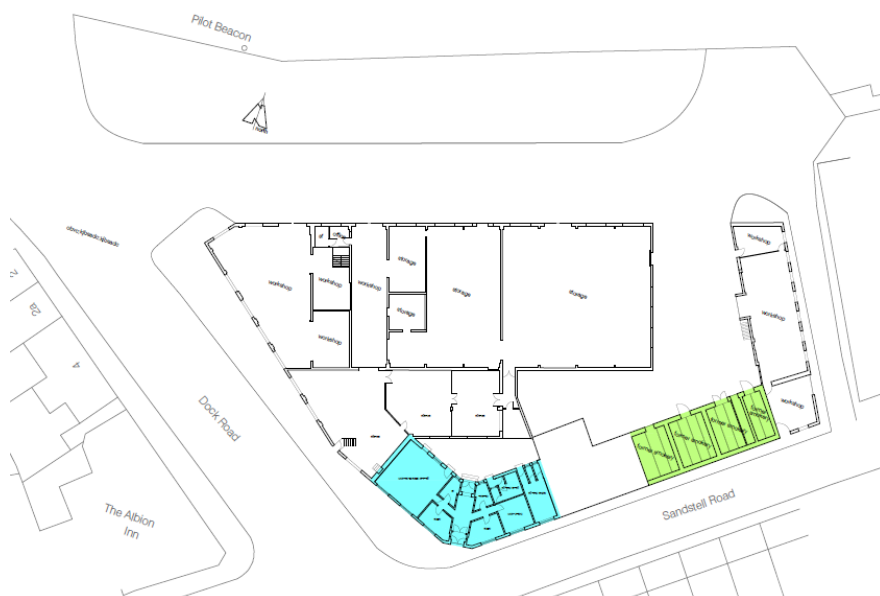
application site highlighted in cyan + grade 2 listed smokehouses (outwith applicant site) shaded in green
